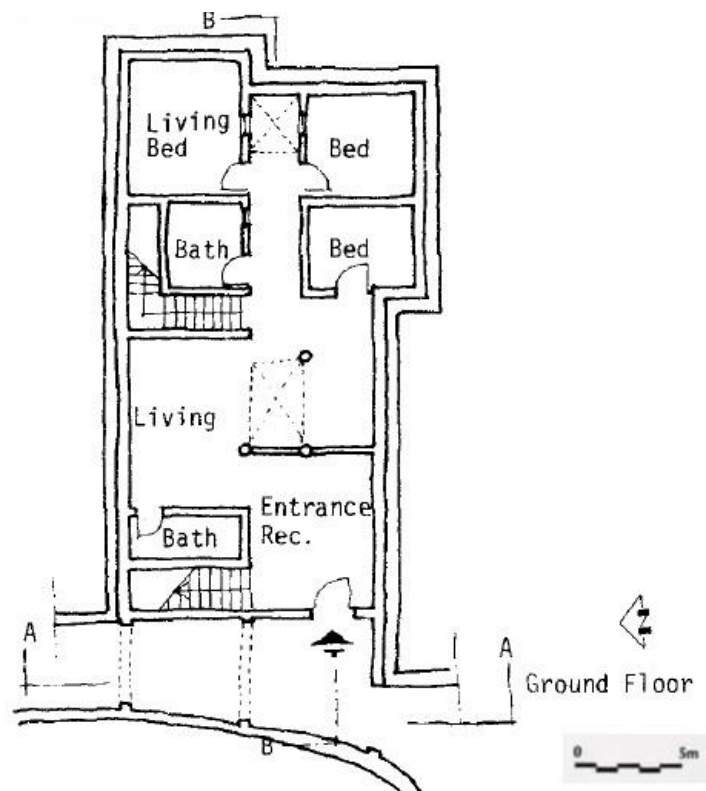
House 2(Ground Floor Plan) Riyadh (Akbar, 1977)
